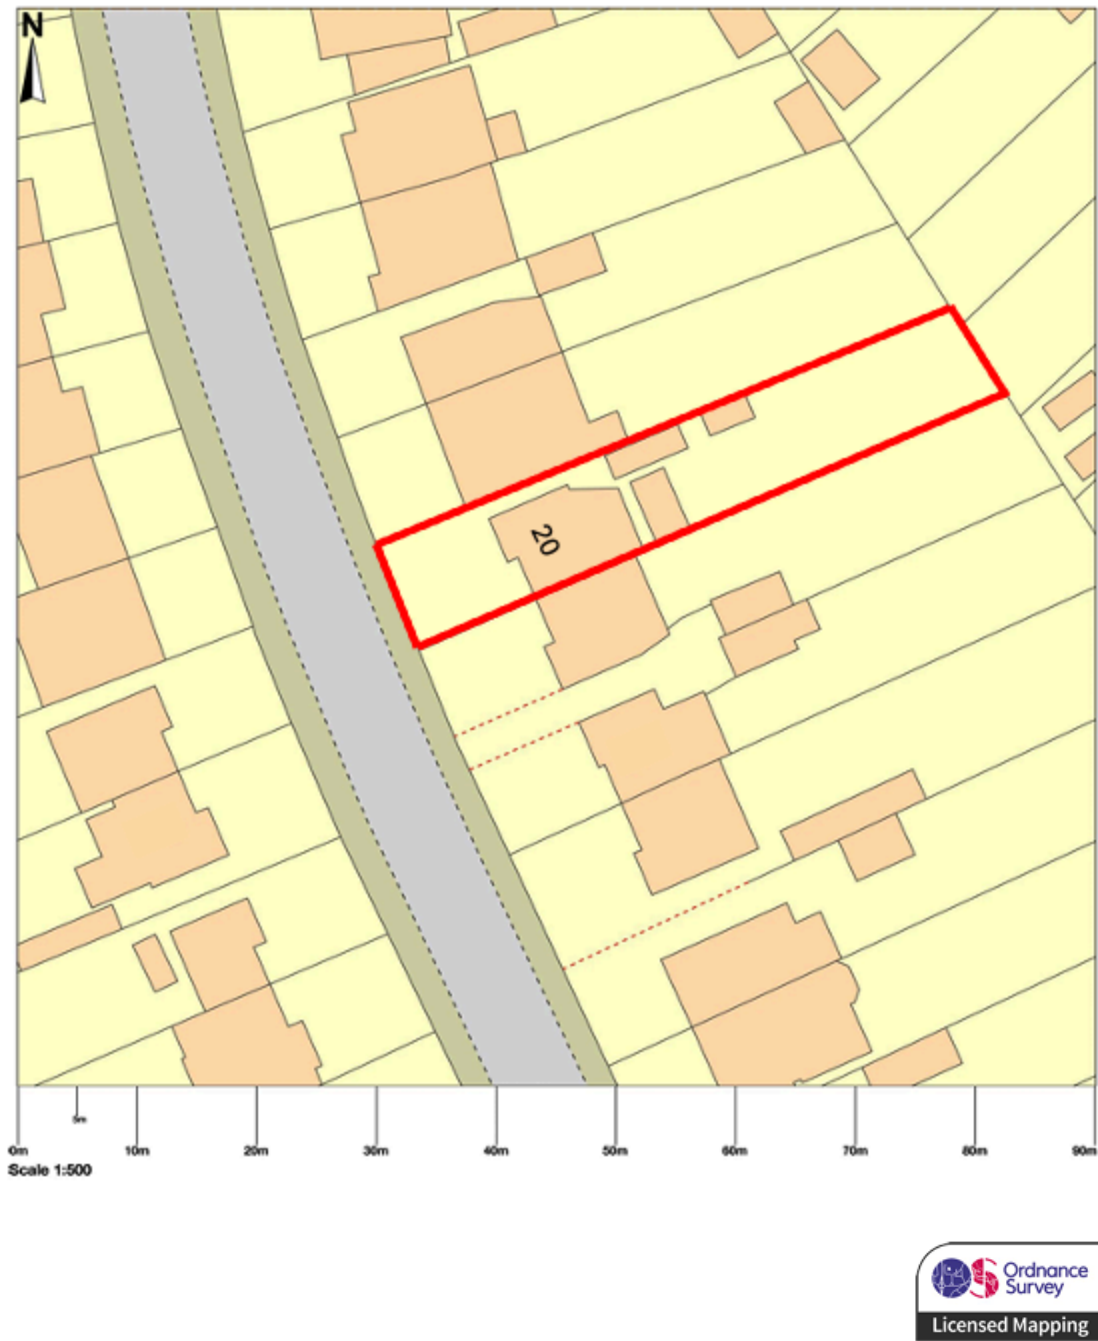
Site plan highlighting the proposed development boundary at 20 Wallasey Crescent, Ickenham.
